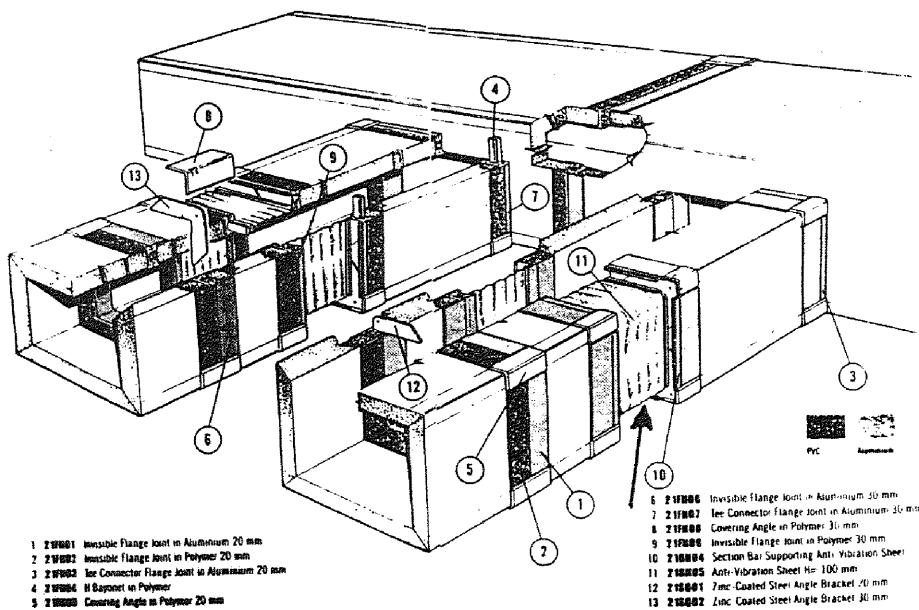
Anti- vibration sheet for duct – sections connection.
